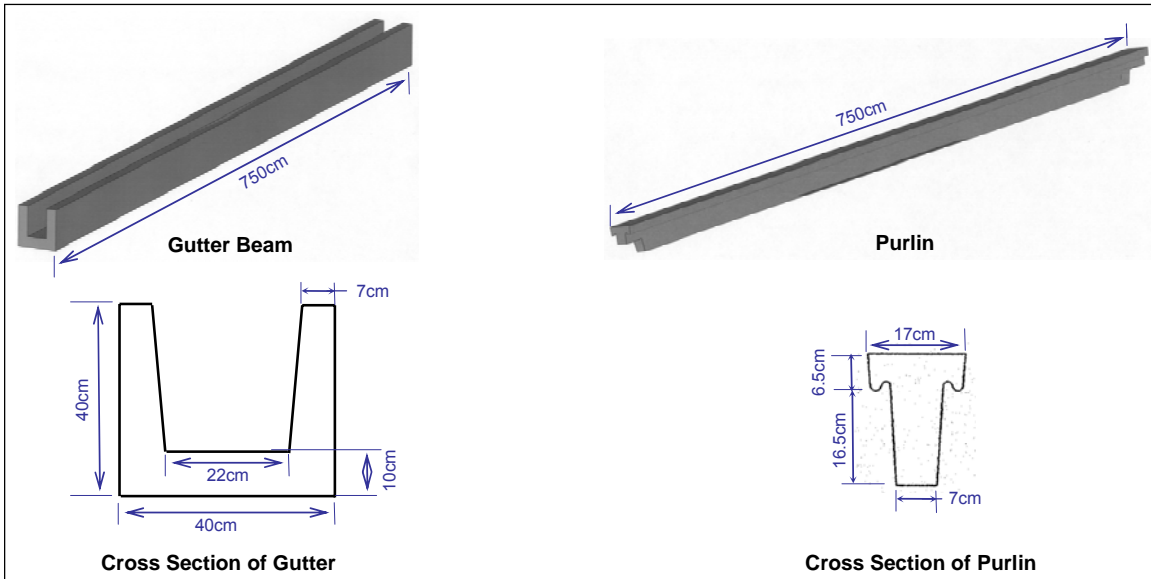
Gutter Beam and Purlin of Prototype Building
